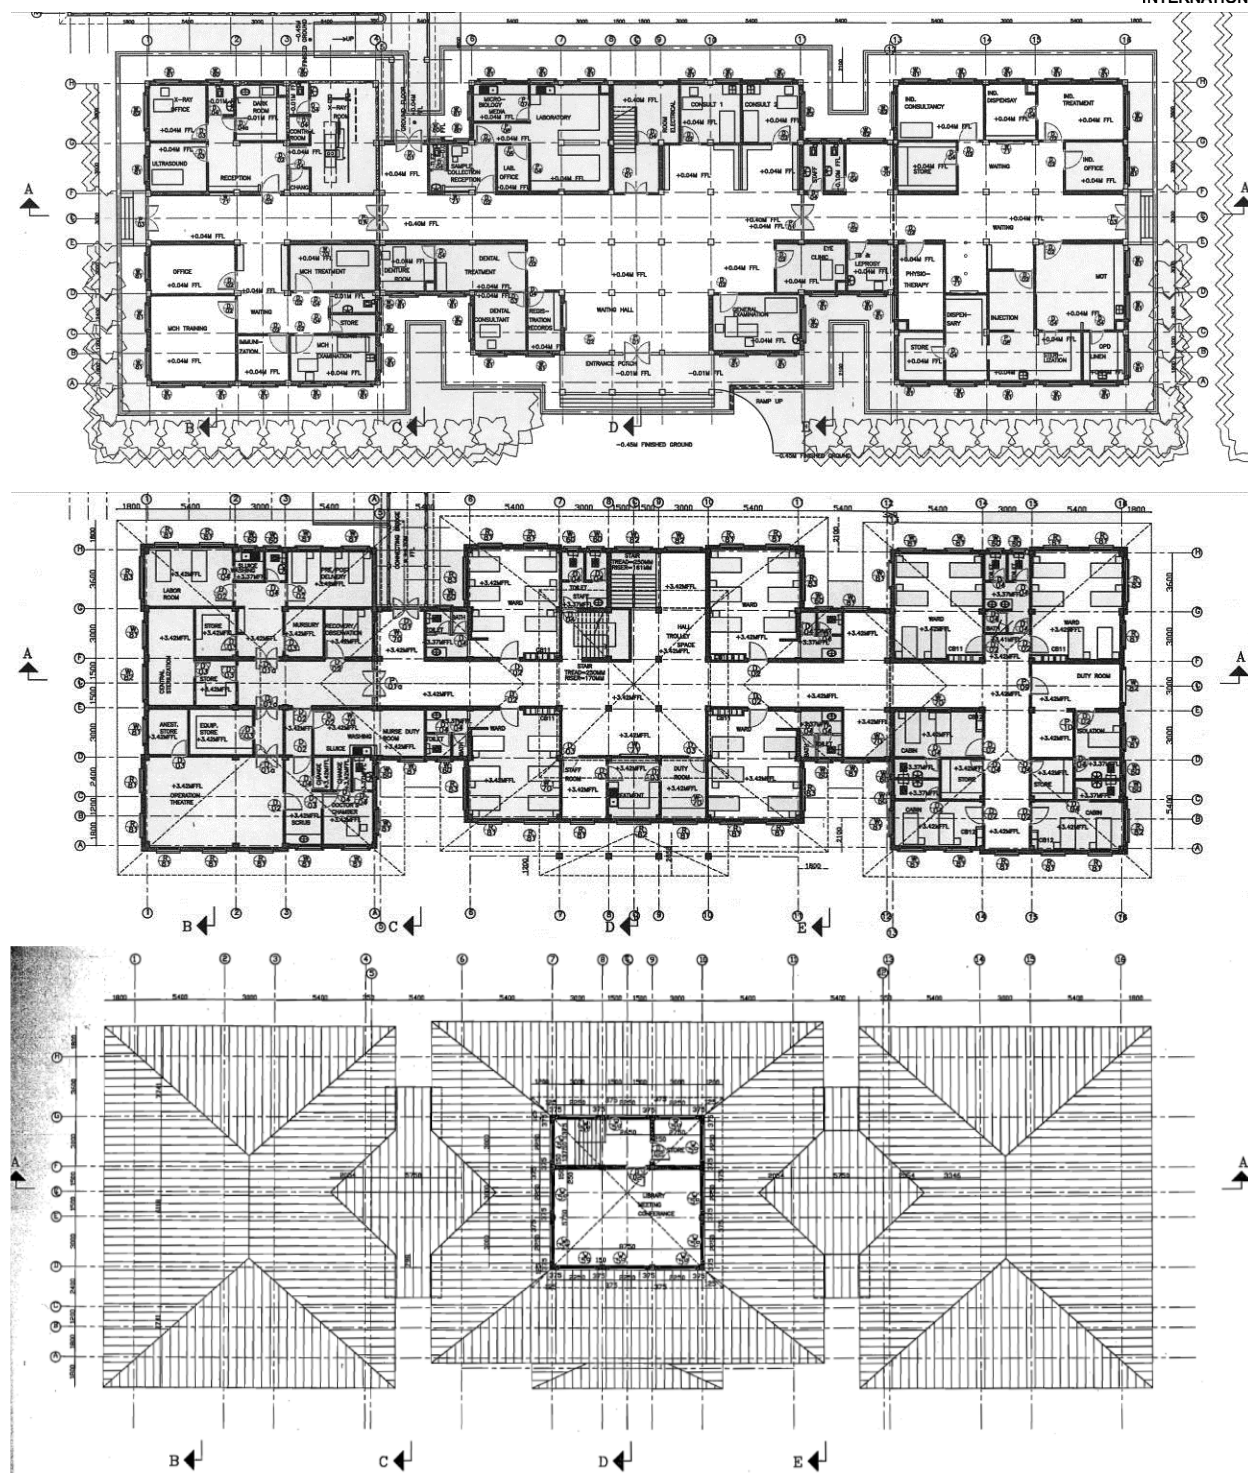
Ground (top), first (middle) and second (bottom) floor plans of Main Hospital building; note that second floor has very small plan area used as a conference room.
